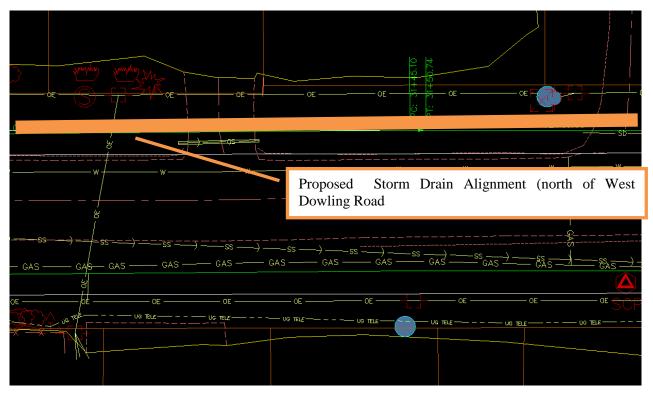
Sample Section of West Dowling Road between Campbell Creek and Potter
